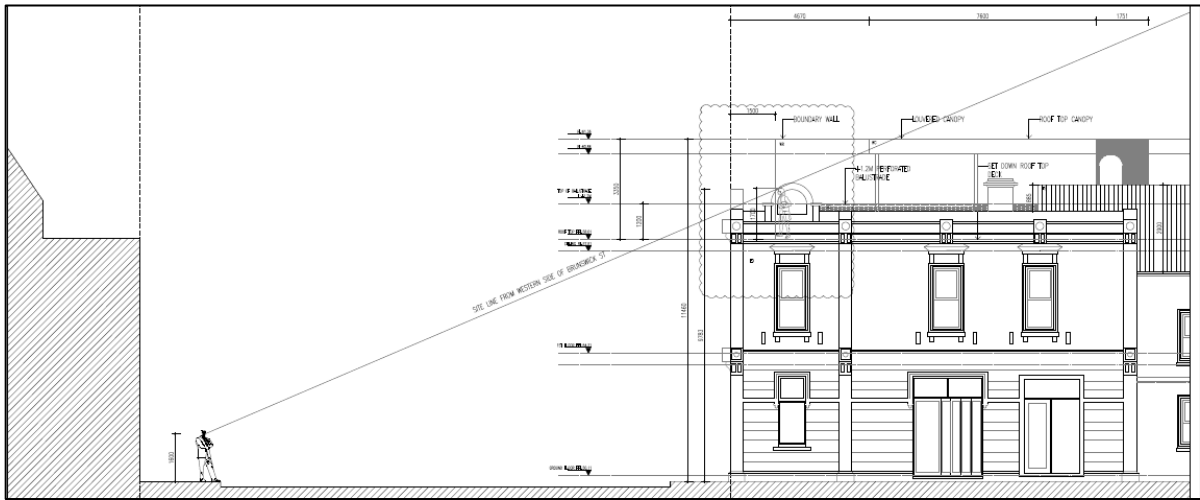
Sightline diagram from Brunswick Street - Sketch plans (29 Sept 2020)
